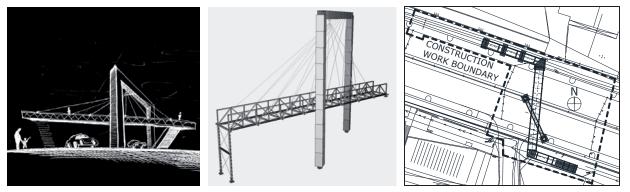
Cable-stayed footbridge "Mejasi" a) Preliminary sketch by Ivan Radeljak, b) Structural model by Ivan Filkovic, c) Area plan
